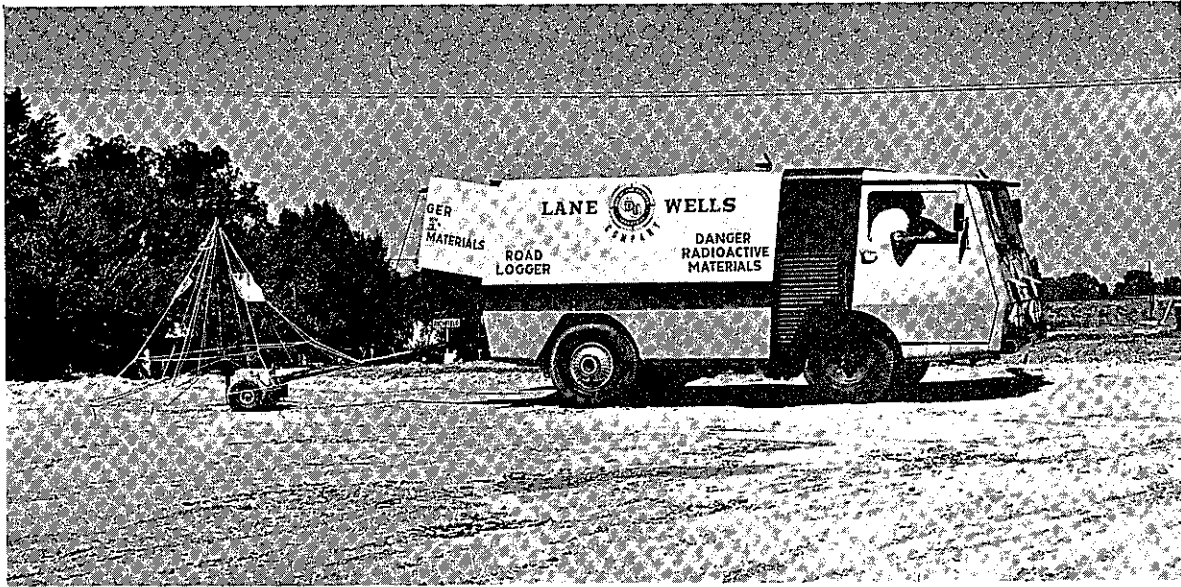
Lane-Wells Road Logger Model No. M-1065
